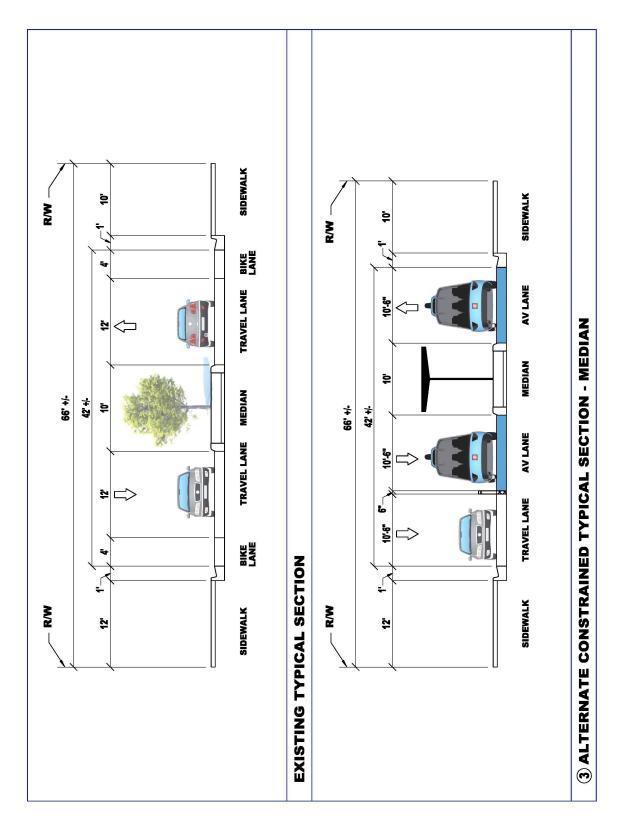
North Corridor Existing and Alternate Constrained Typical Section with Median Station - W. 8th Street
